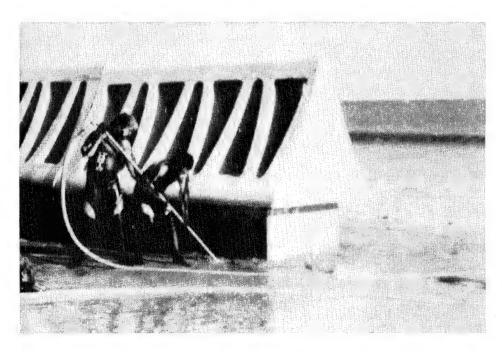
Beach Beam modules being installed for shoreline protection (from *Concrete Products* 1993)
